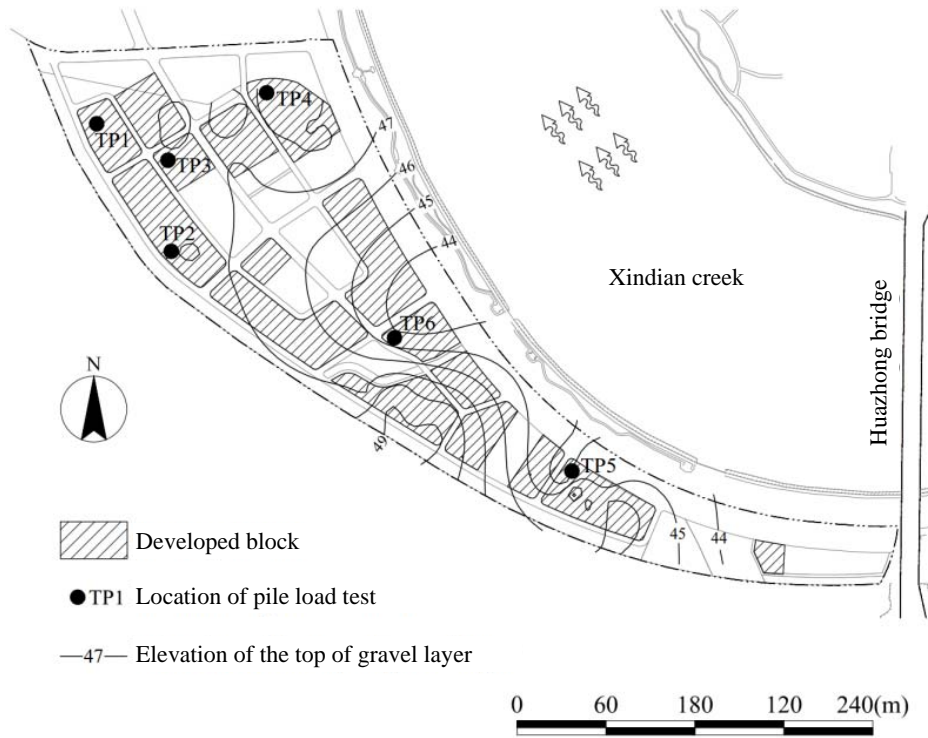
Site plan and locations of test barrette piles (Taipei site)
